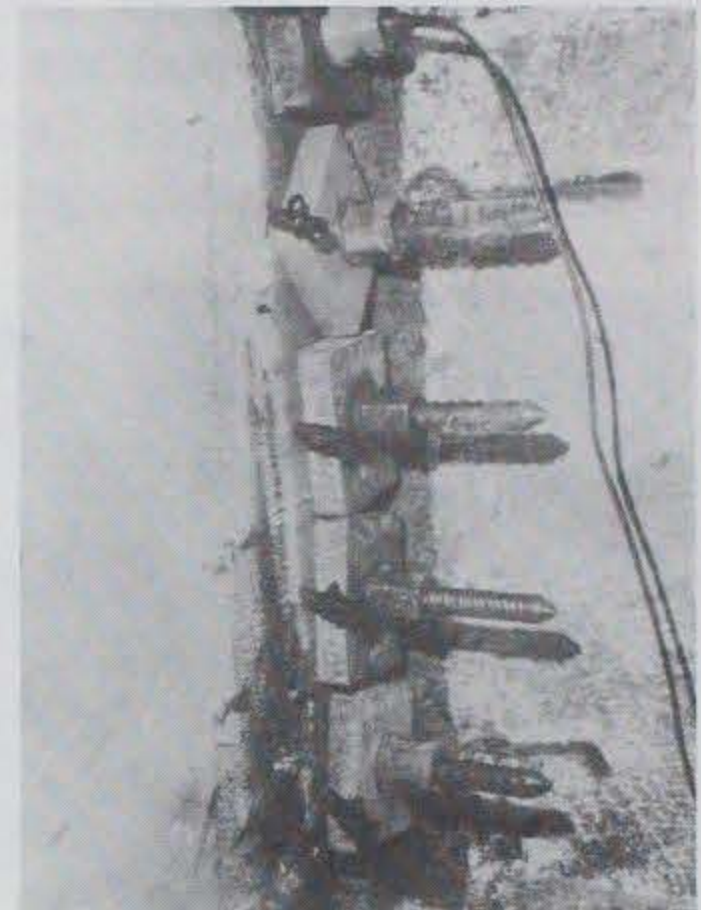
Strain gages measuring loads in the corner bolts of the rigid connection.
